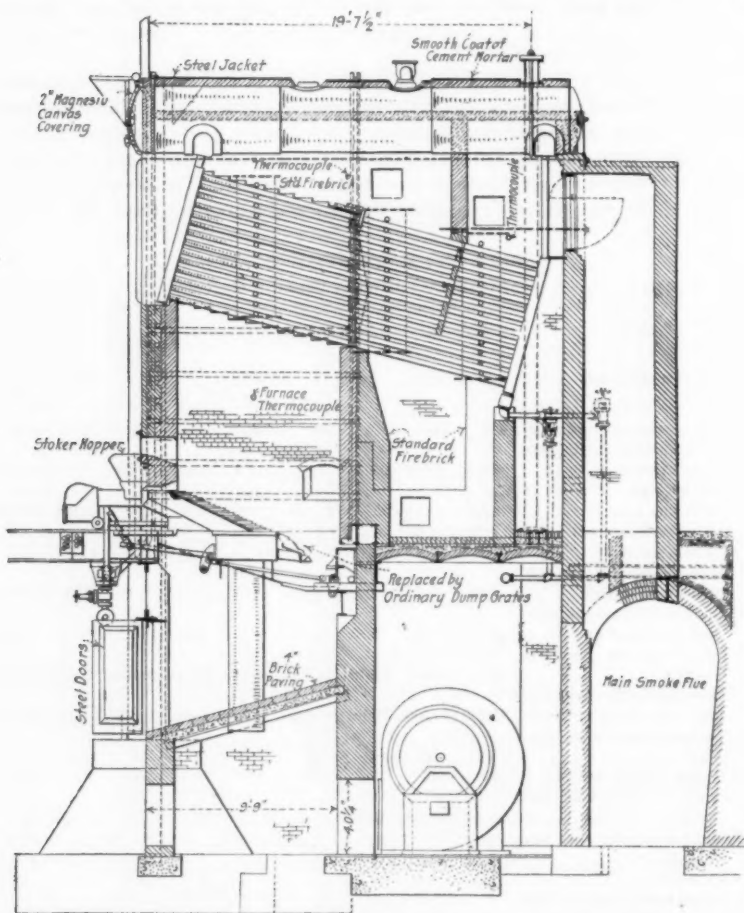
SECTIONAL VIEW OF BOILER UNIT OF THE CLEVELAND RAILWAY COMPANY
